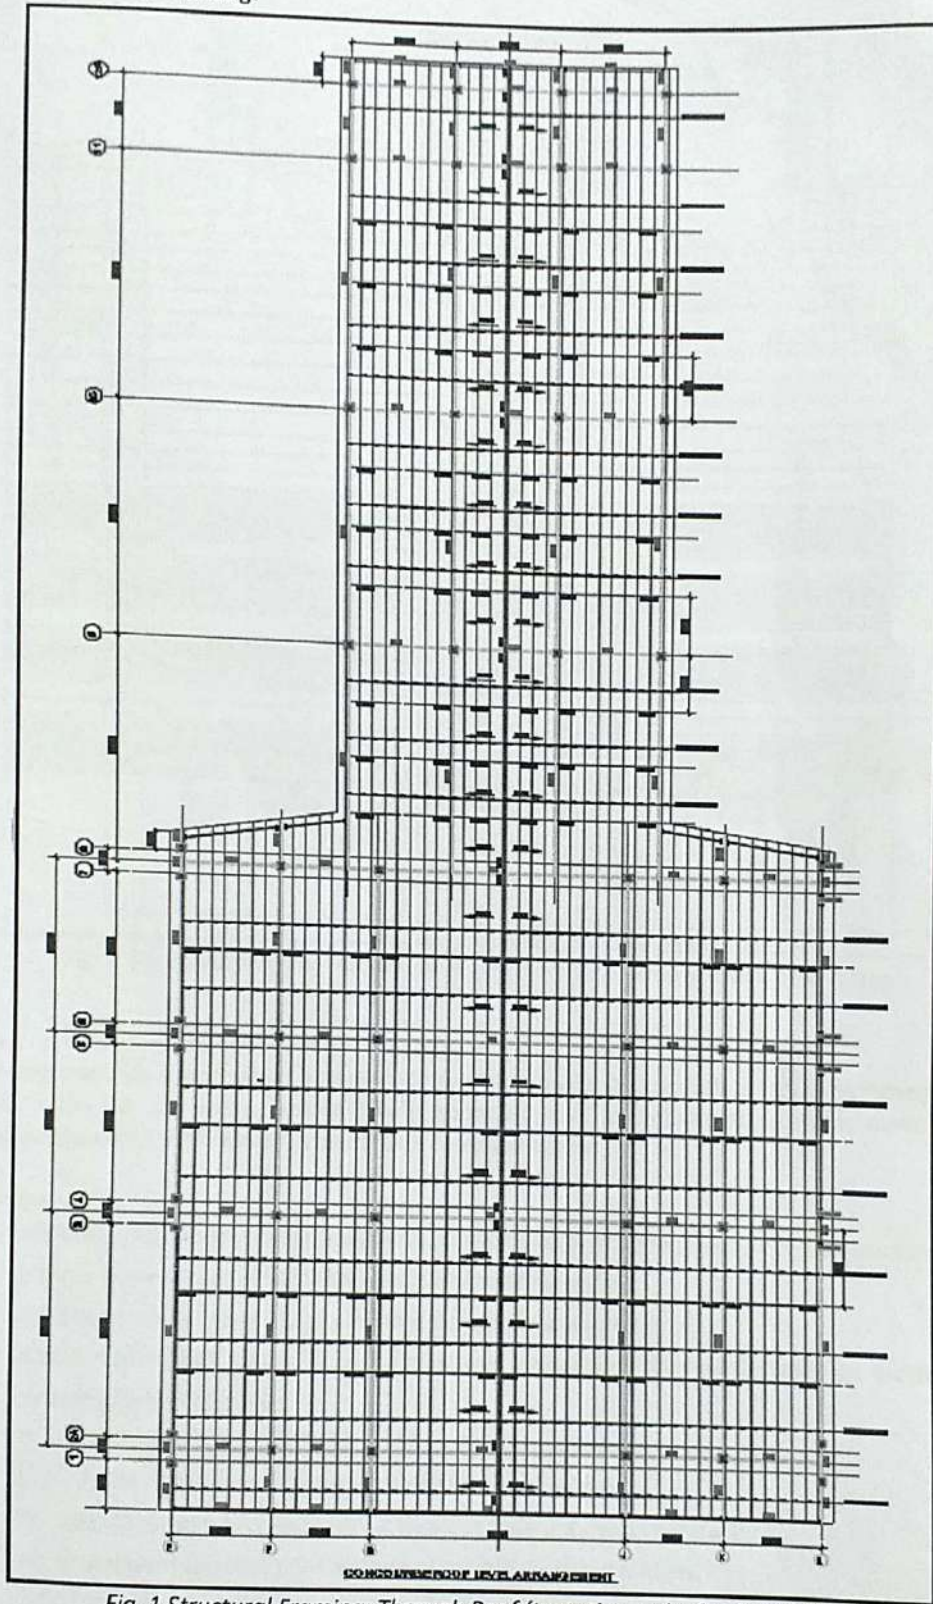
Structural Framing: Through Roof (tentative, to be finalized after design)
